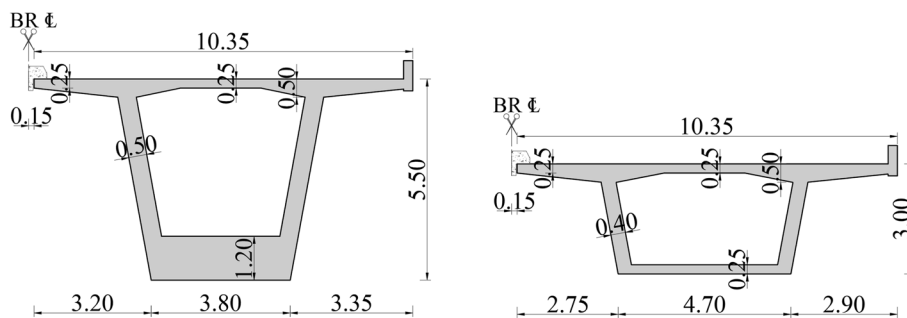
Typical cross-sections of Talkha Bridge at inner piers and at mid navigation span
